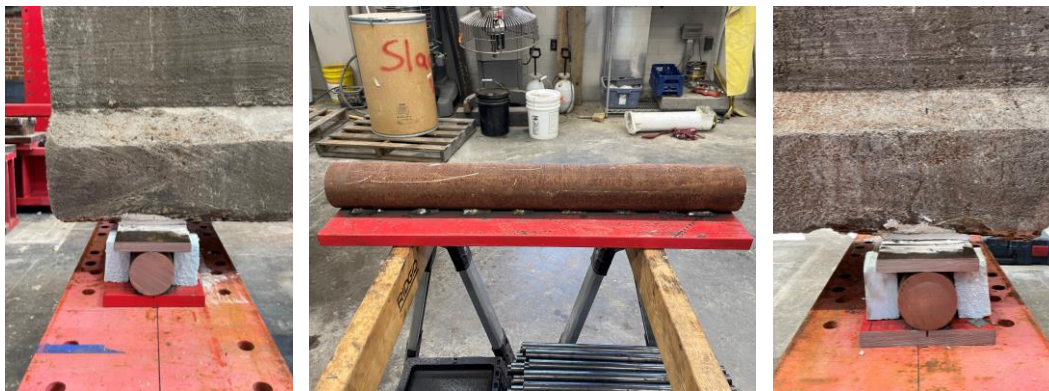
Support condition pin (left), pin stitch weld (center), and roller (right).
